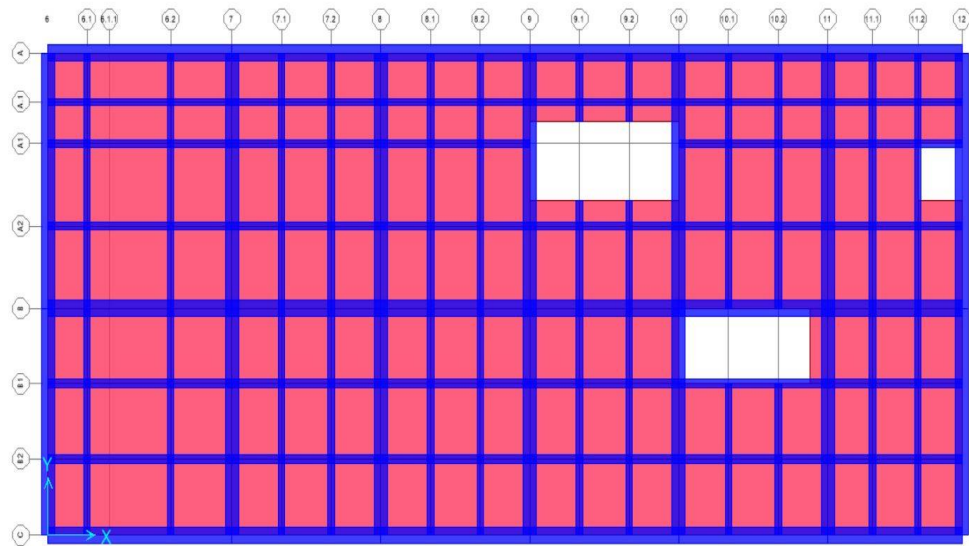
Second floor plan view of the structure in the XY plane(SAP2000 Floor Plan Image, prepared within the scope of this thesis study.).
